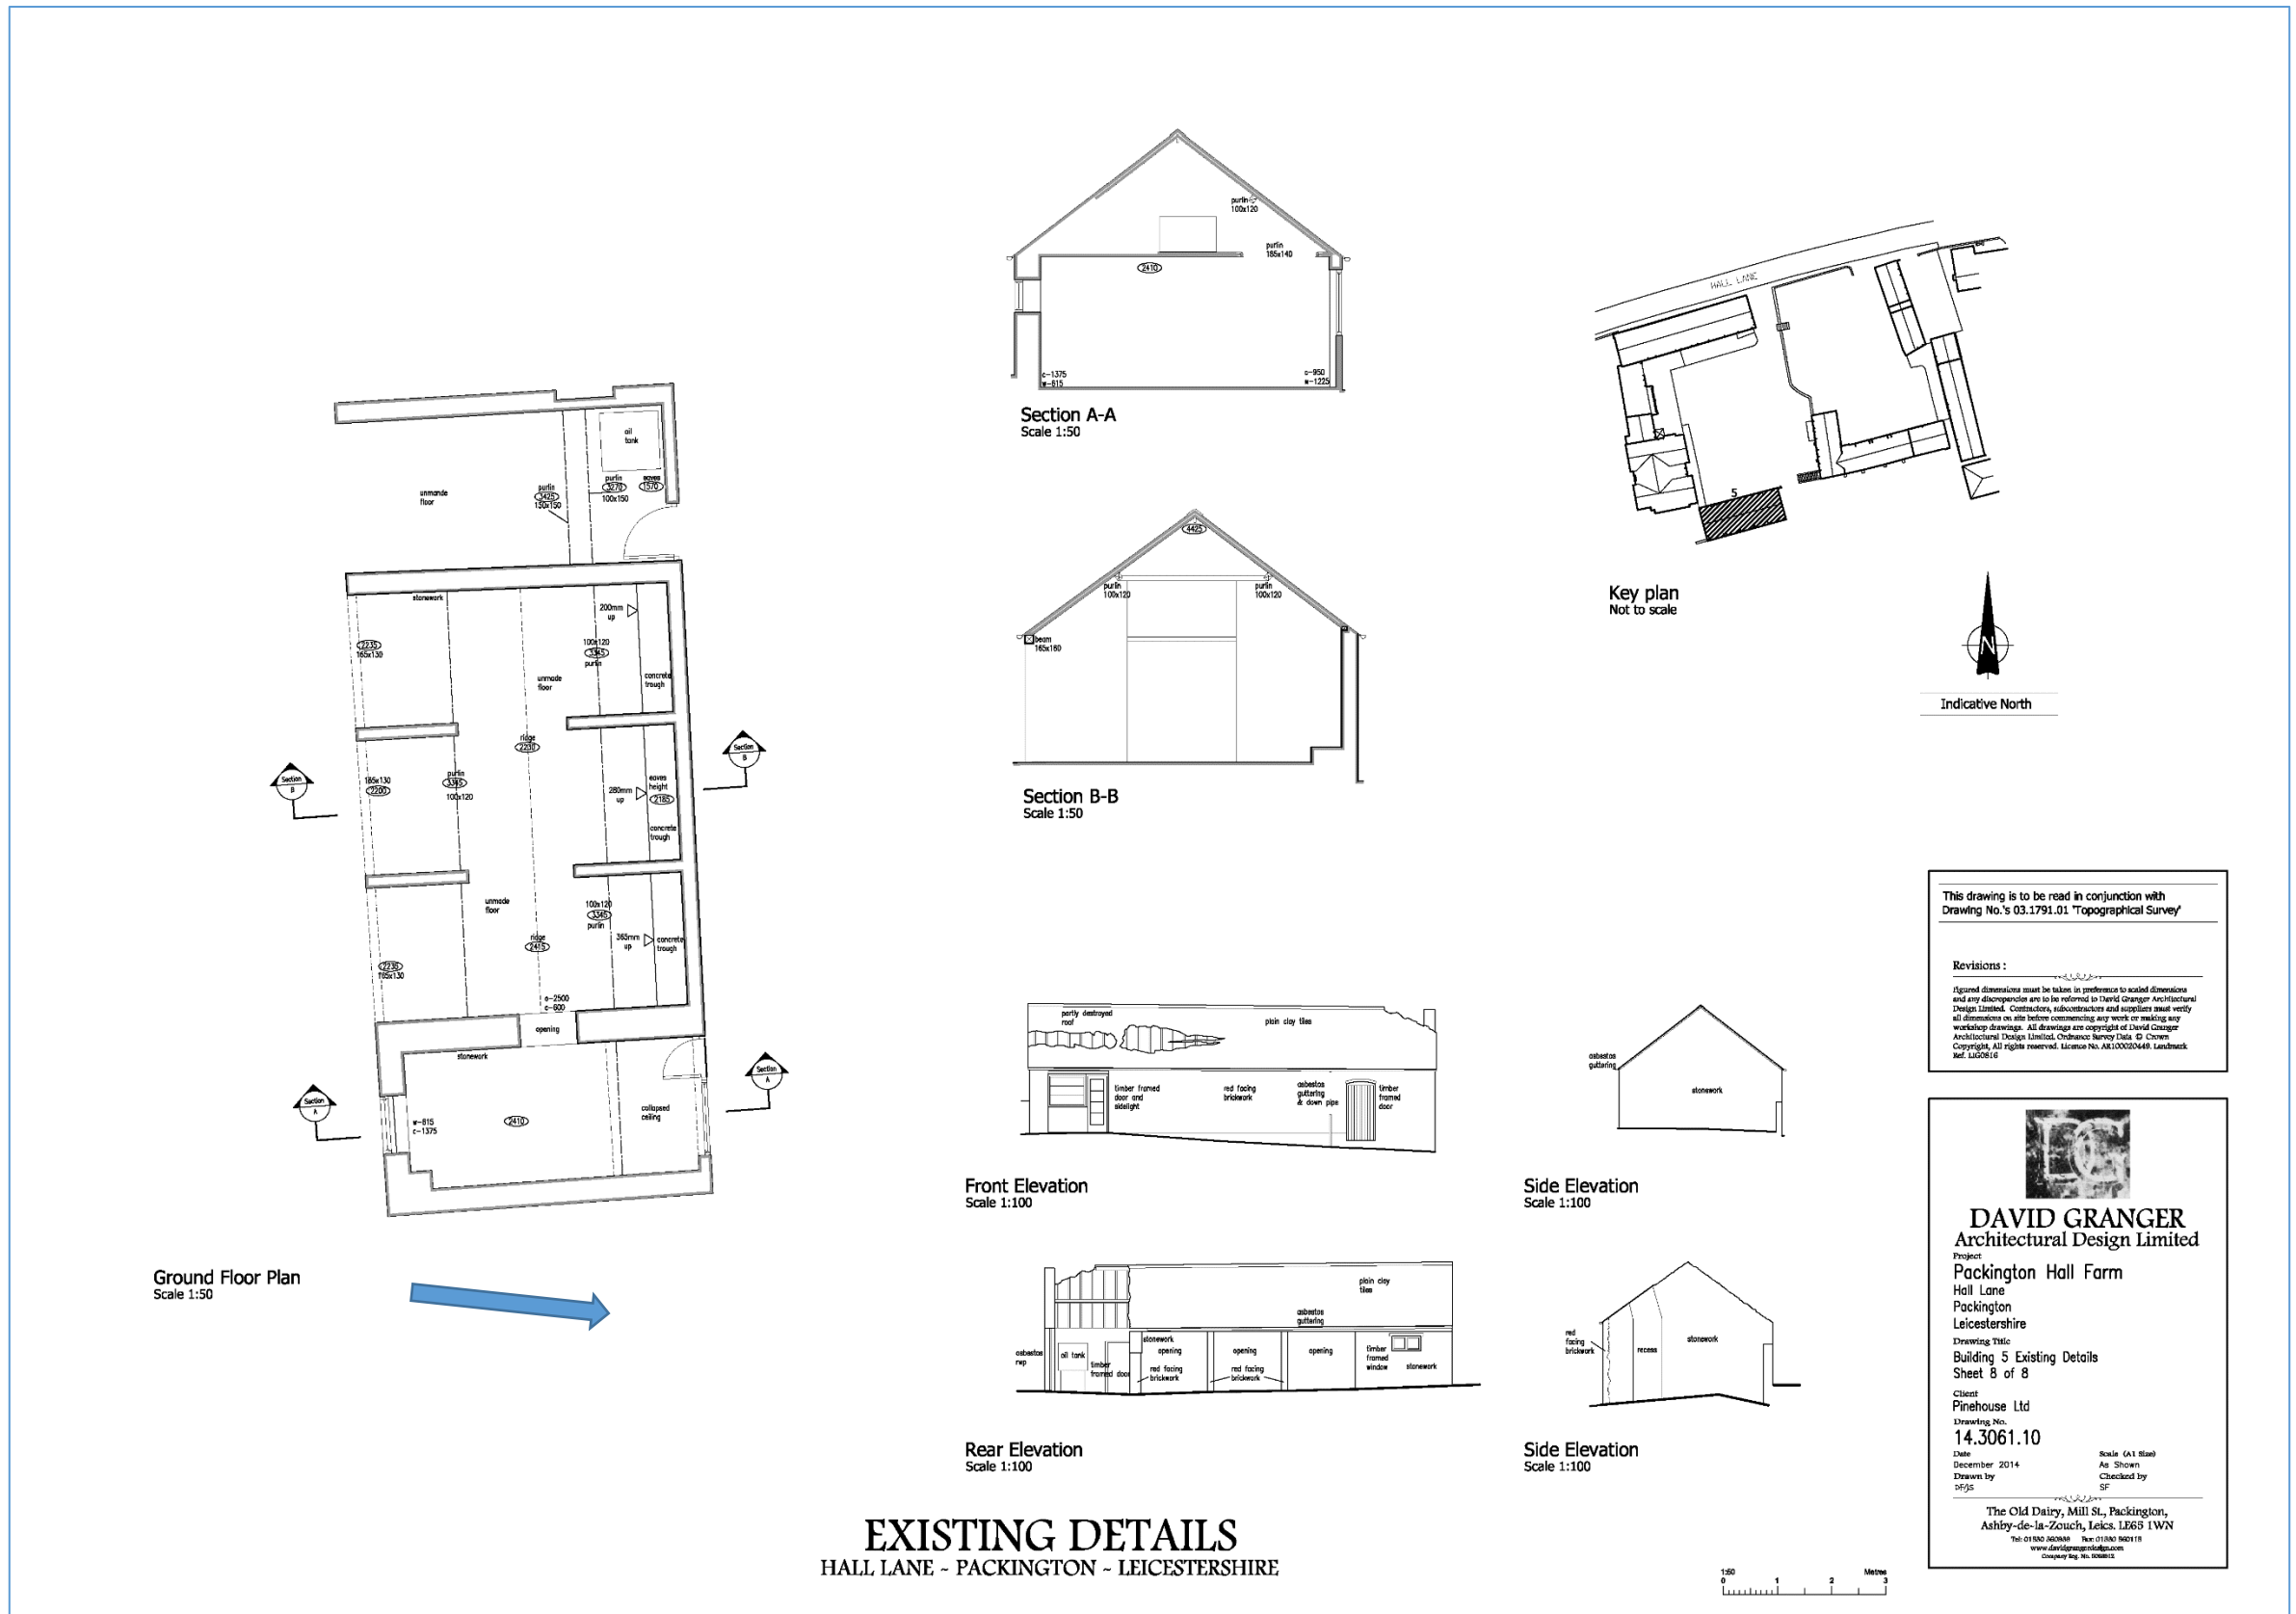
Block F: floorplan, elevations, sections. Provided by client
